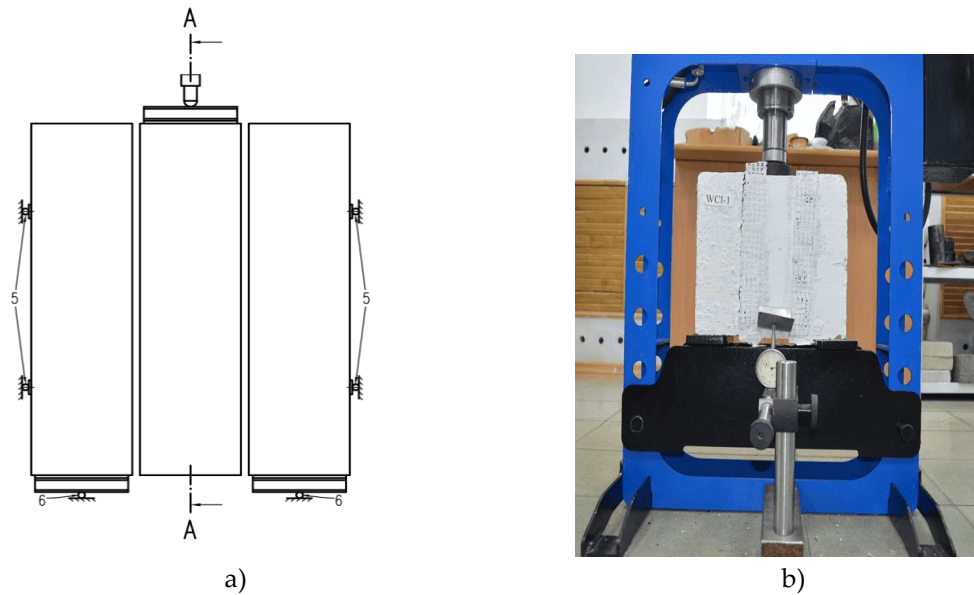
Diagram of an alternative test facility: 1 – hydraulic jack; 2 – soft fiberboard; 3 – clock type indicator or motion sensor; 4 – mechanical or continuous connection; 5 – side supports with force sensor; 6 – steel roller; 7 – steel rollers with a diameter of 40 mm [53]
